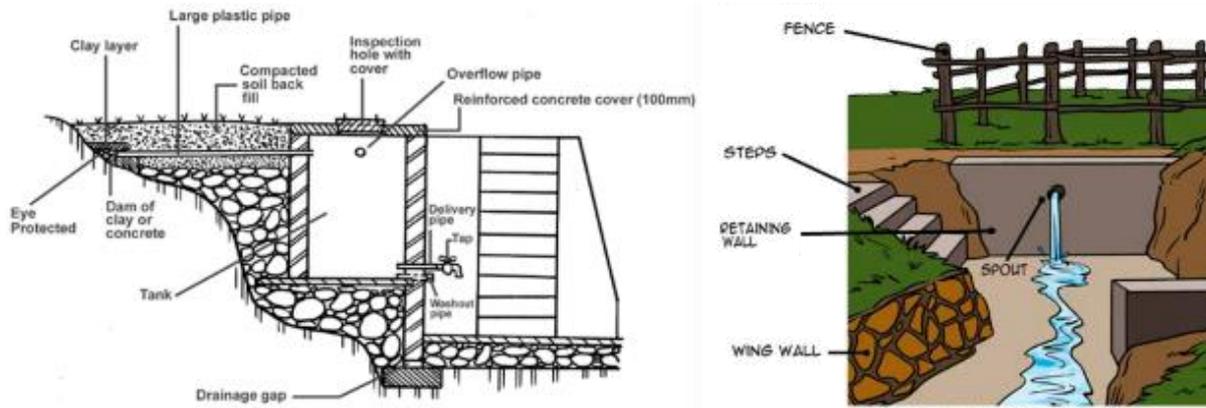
Protected Spring (adapted from Ministry of Water and Environment, Uganda)
